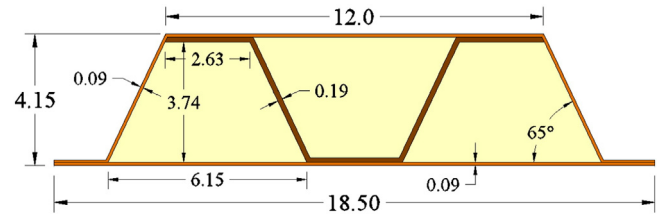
Schematic of mid-scale panel cross section (all dimensions in inches, 1 in. = 25.4 mm).
